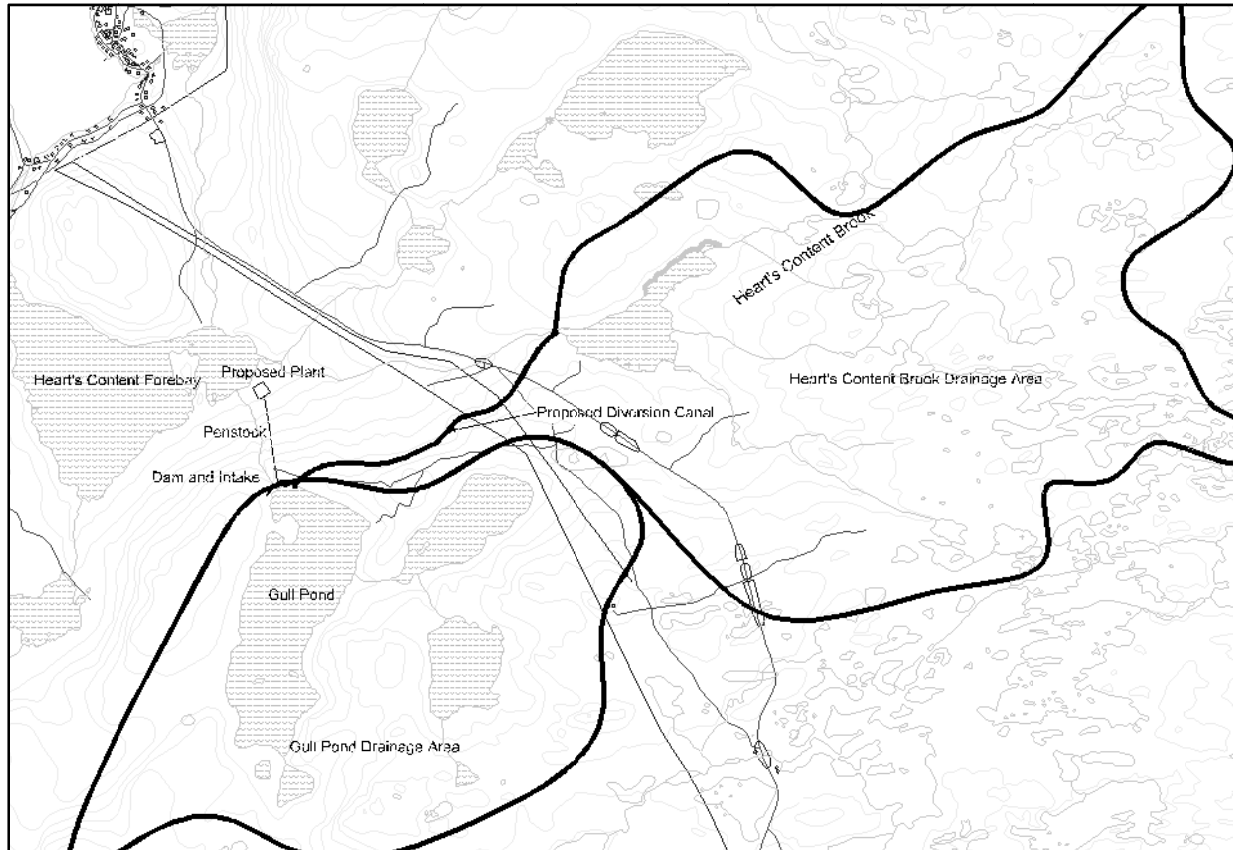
Conceptual Layout of Proposed Plant at Gull Pond
